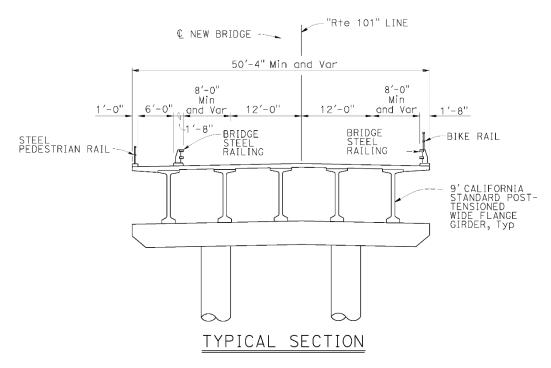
Section of Proposed Pre-Cast Bridge Looking North, Pedestrian Walkway on Left
